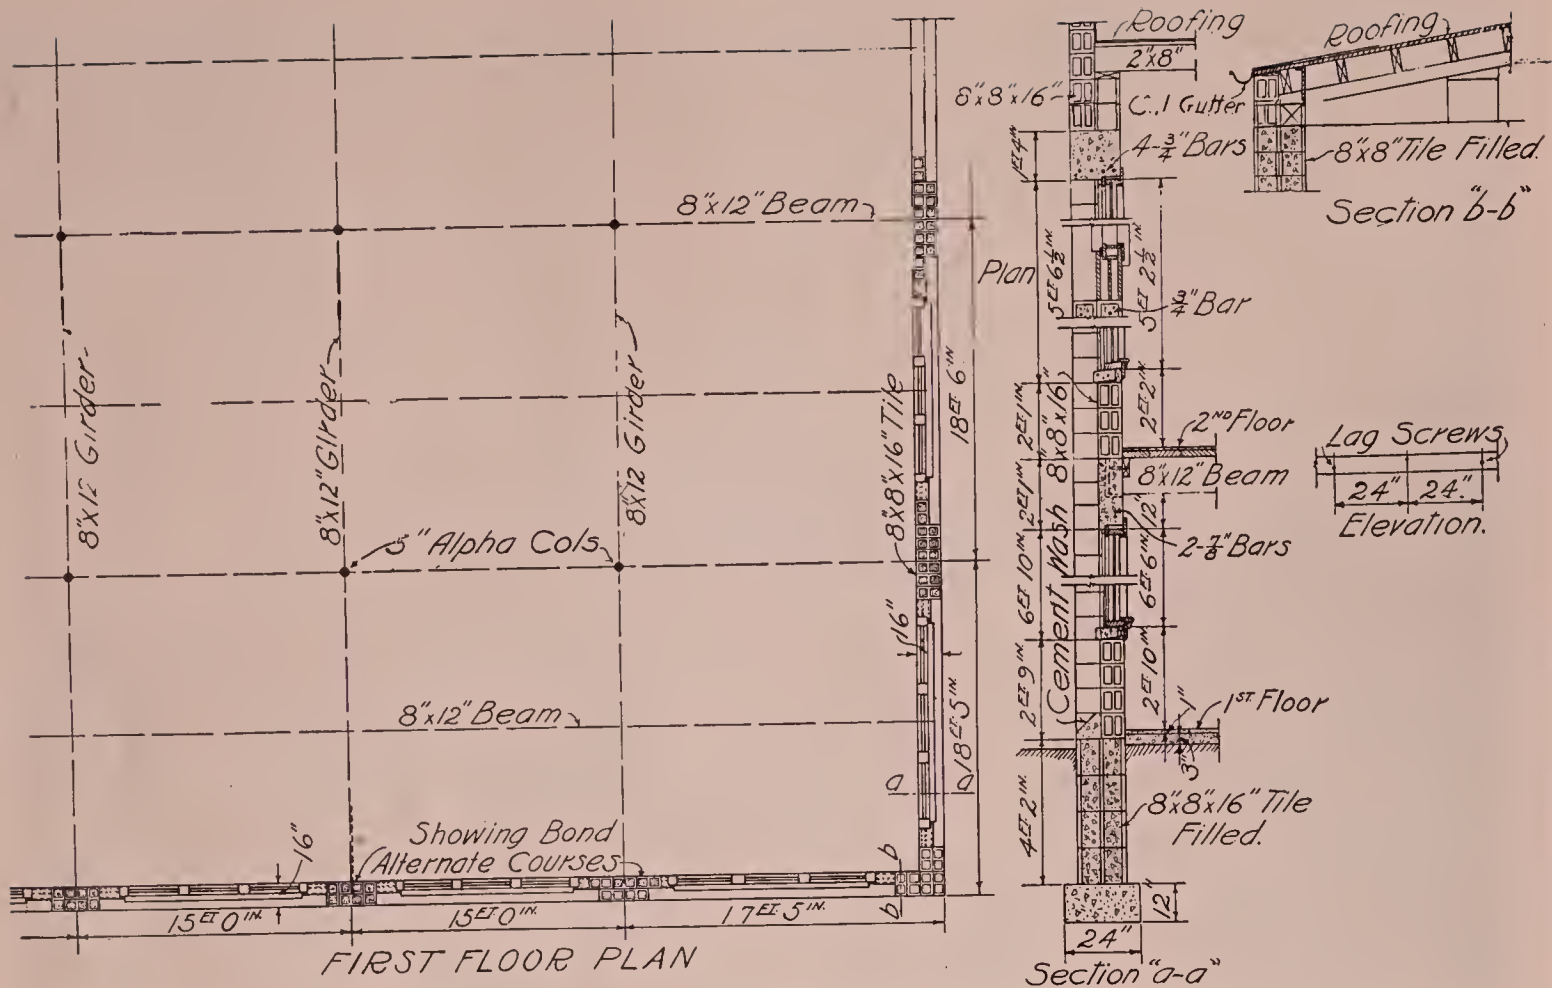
Partial Plan and Cross Section of Hunter Factory.
